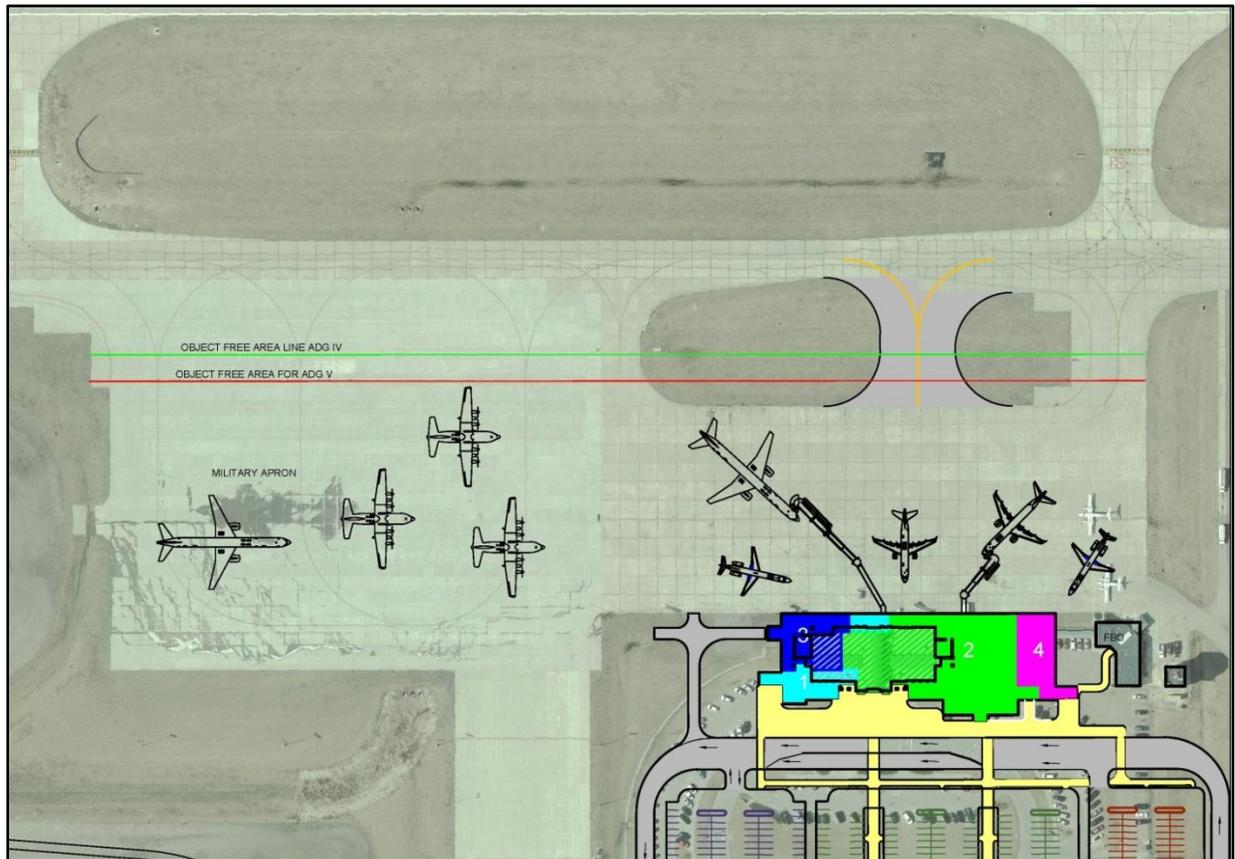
PRELIMINARY PAVED ISLAND LAYOUT
